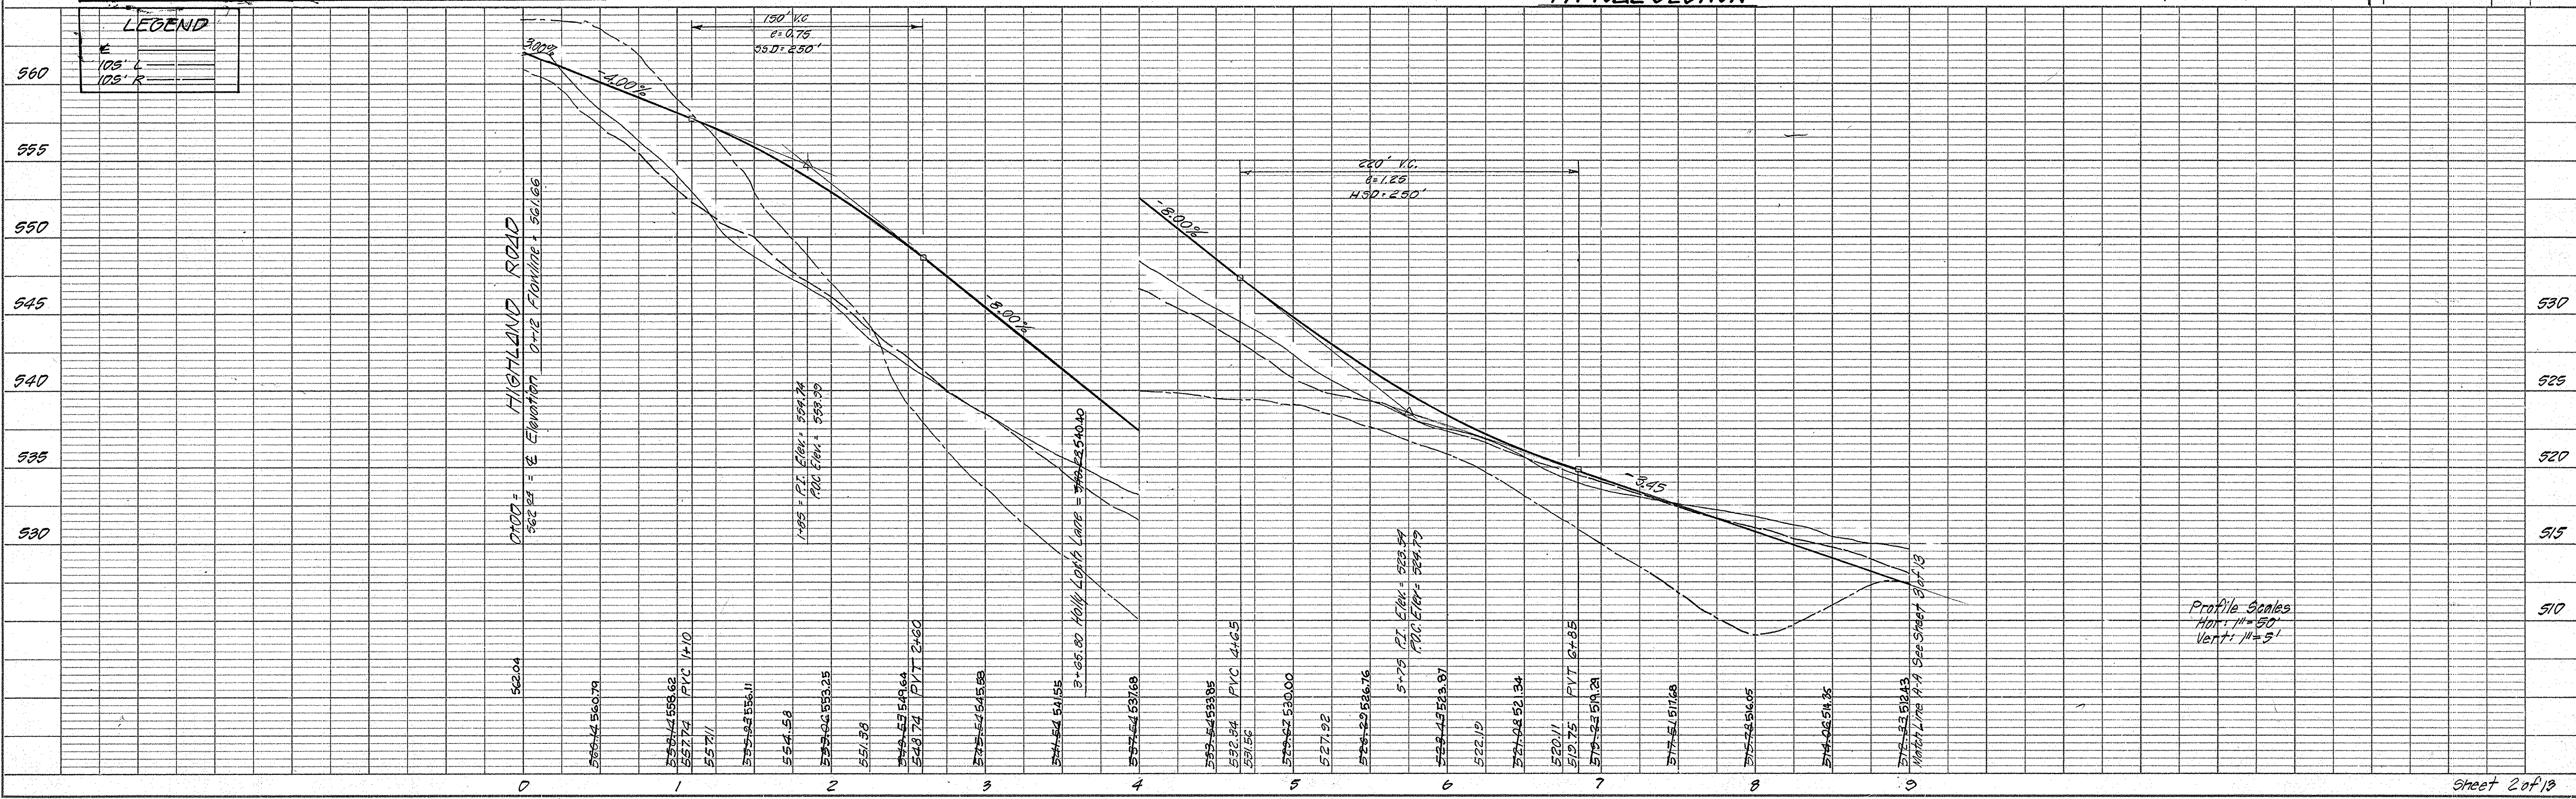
PLAN-PROFILE 3 P R STANDARD
